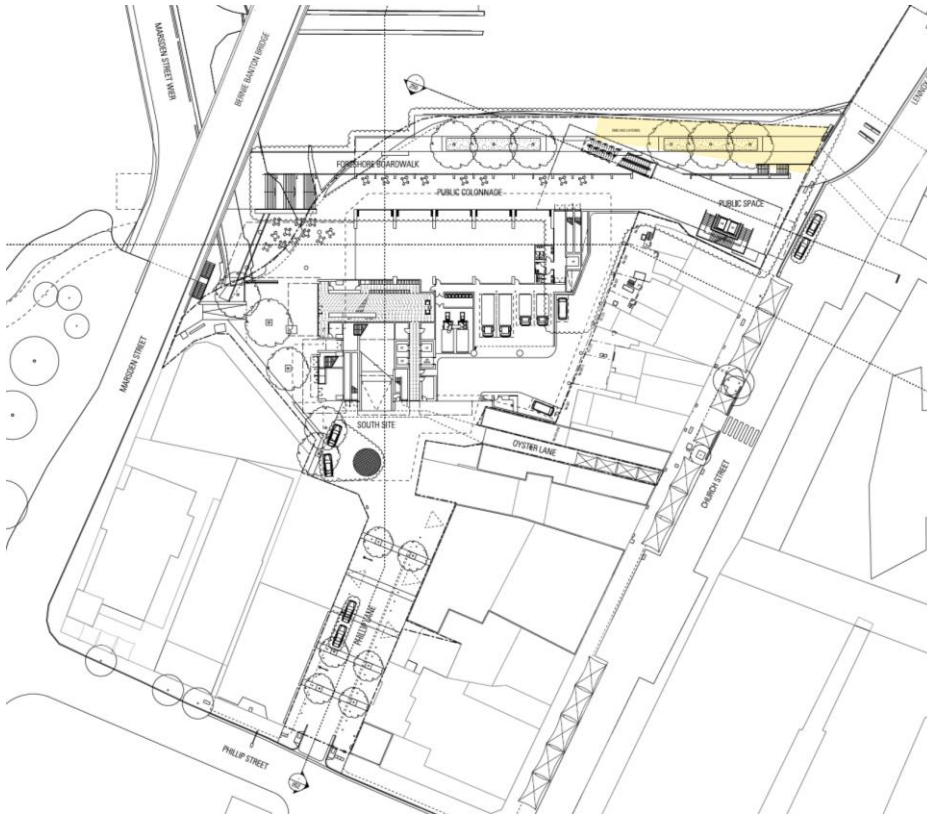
Approved Site Plan (Source: JPW, 2015)
